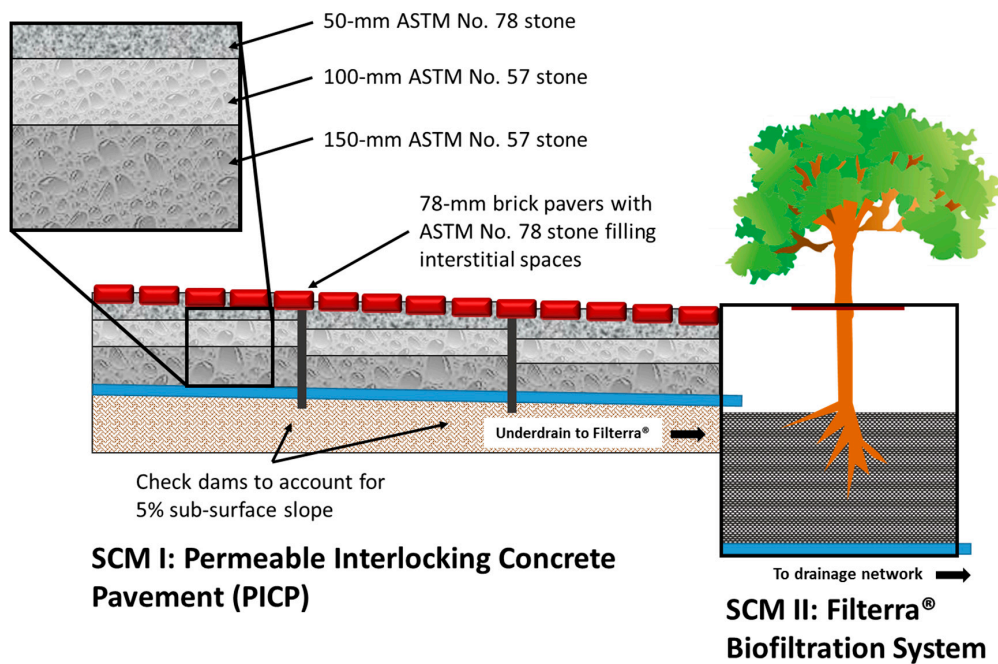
Schematic of the PICP-Filterra[®] system with permeable interlocking concrete pavement and Filterra[®] biofiltration system (figure not to scale).
